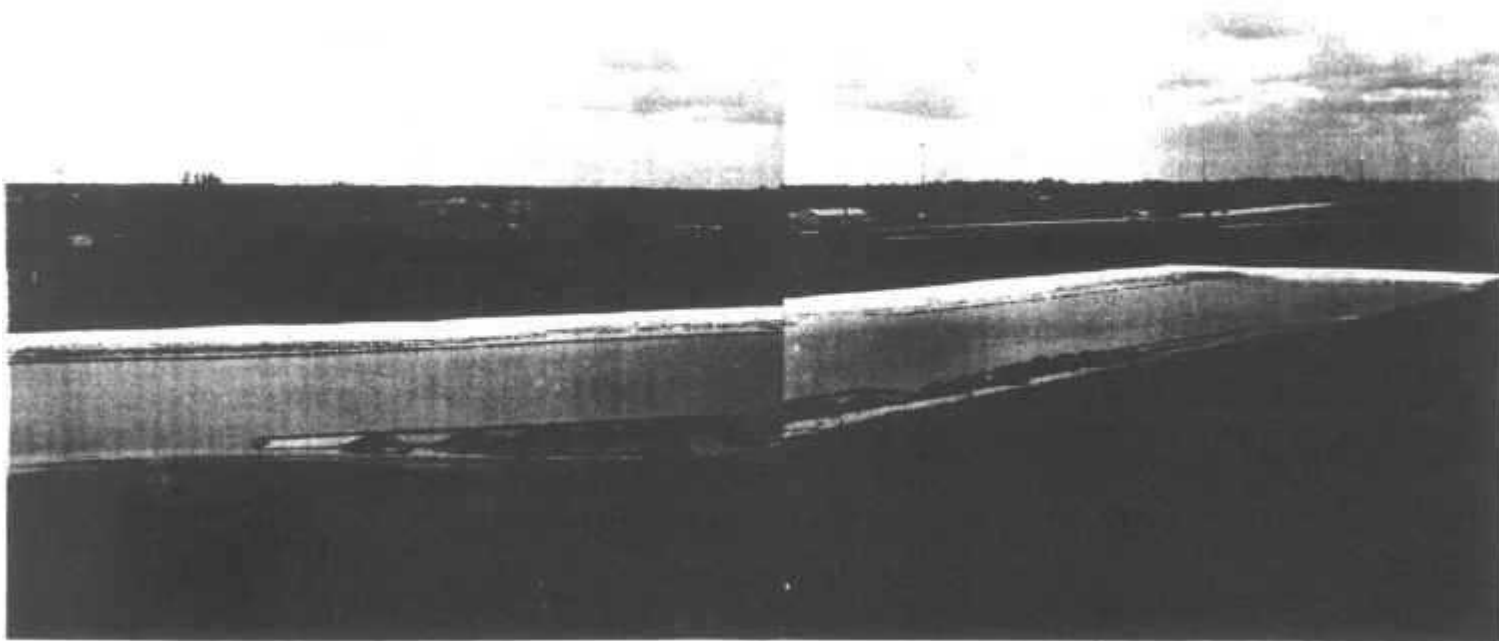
Landscaping of the trash landfill was underway (September 1993).
